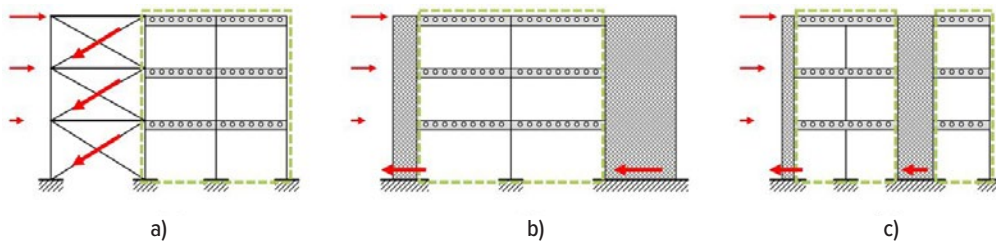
DESIGN OPTIONS FOR DELTABEAM® COMBINED WITH (A) STEEL BRACINGS AND (B) CONCRETE WALLS OR (C) WITH PINNED COLUMNS
